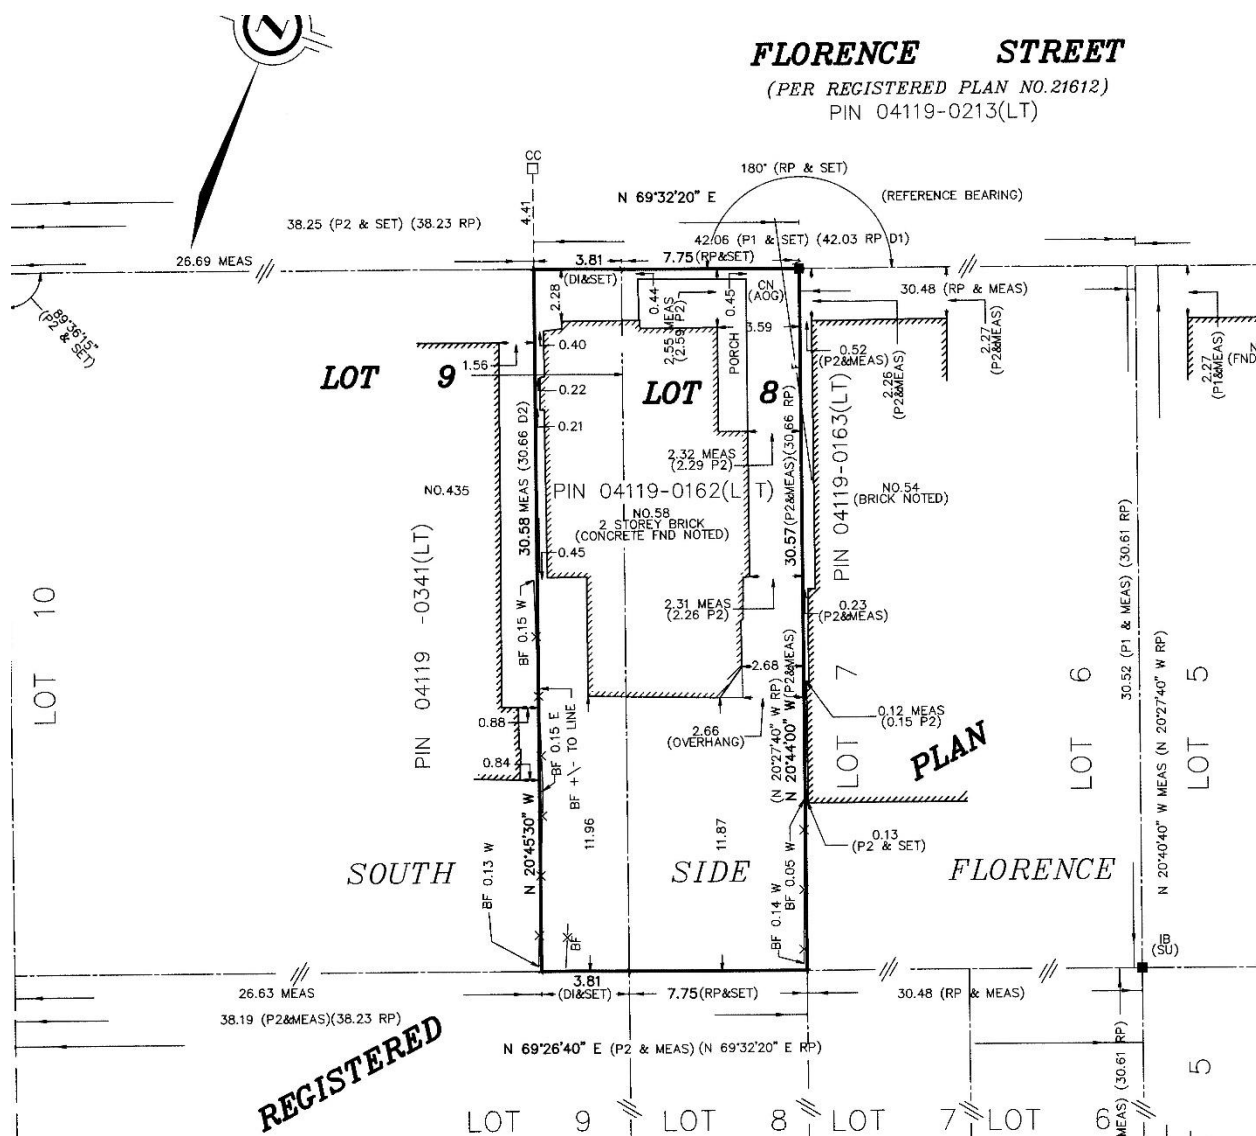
Survey plan of 58 Florence Street illustrating the existing and adjacent buildings setbacks from the street. Source: J.D. Barnes Ltd. June 22, 2012.
